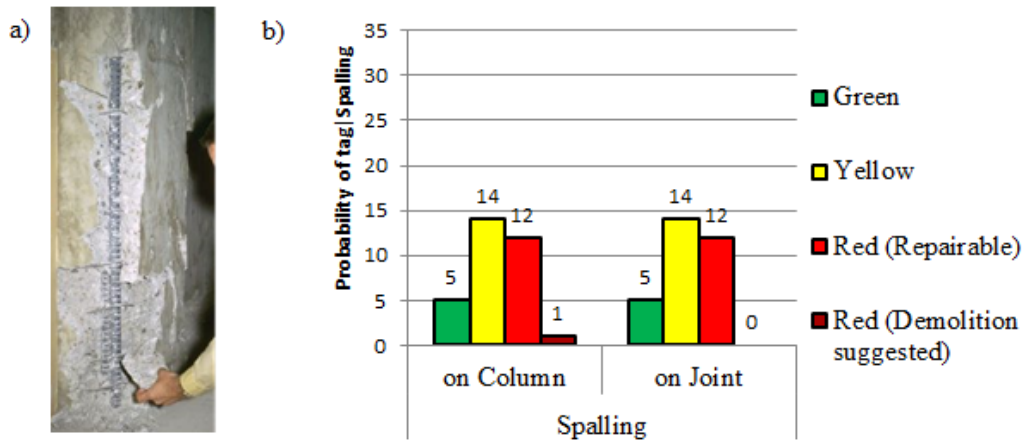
(a) An example of spalling on a column shown in the survey. (b) Probabilities of column and joint spalling receiving tags.
